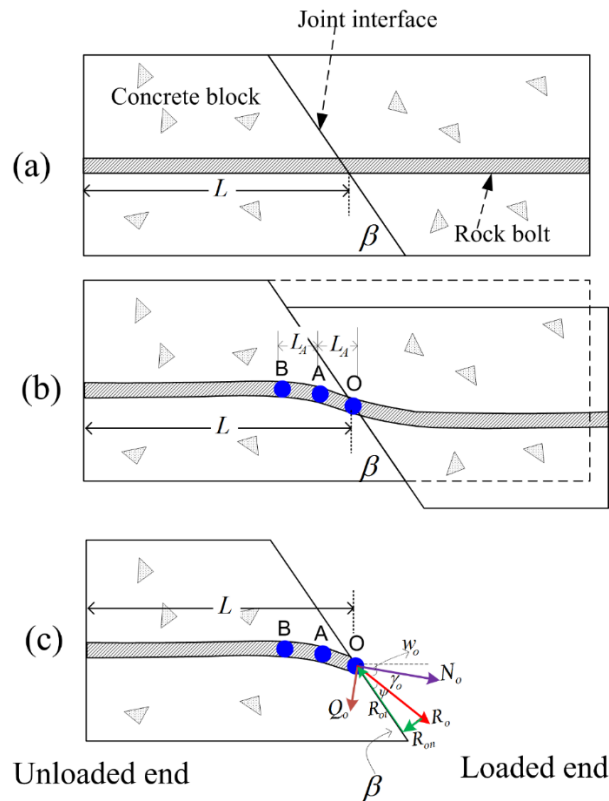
Deformation of rock bolts when subjected to shear loads. (a) Bolted joint before shearing; (b) Deformed bolt in the two joint blocks; (c) Forces developed in the bolt.
